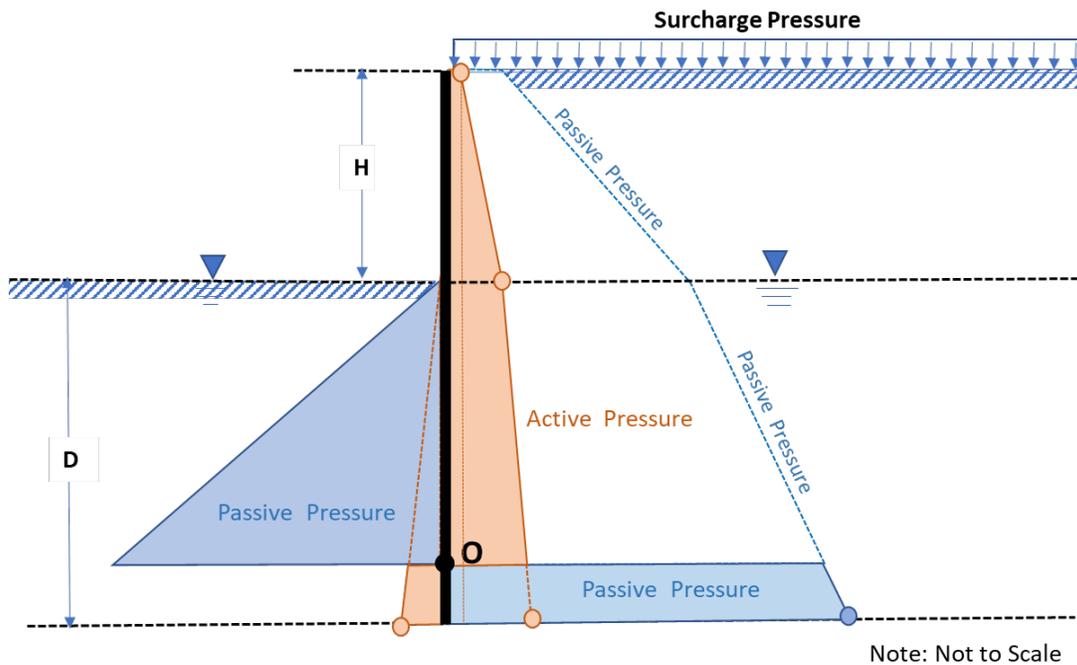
Fixed-earth sheet pile assumed pressures.
